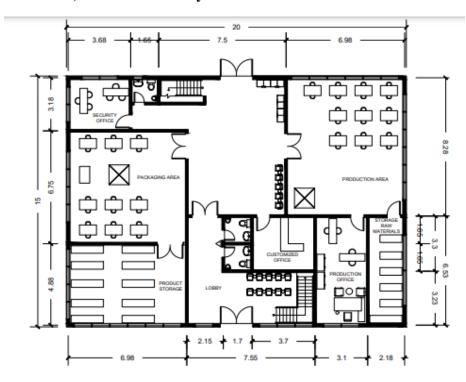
Office, Store and Factory Floor Plan: Ground Floor
